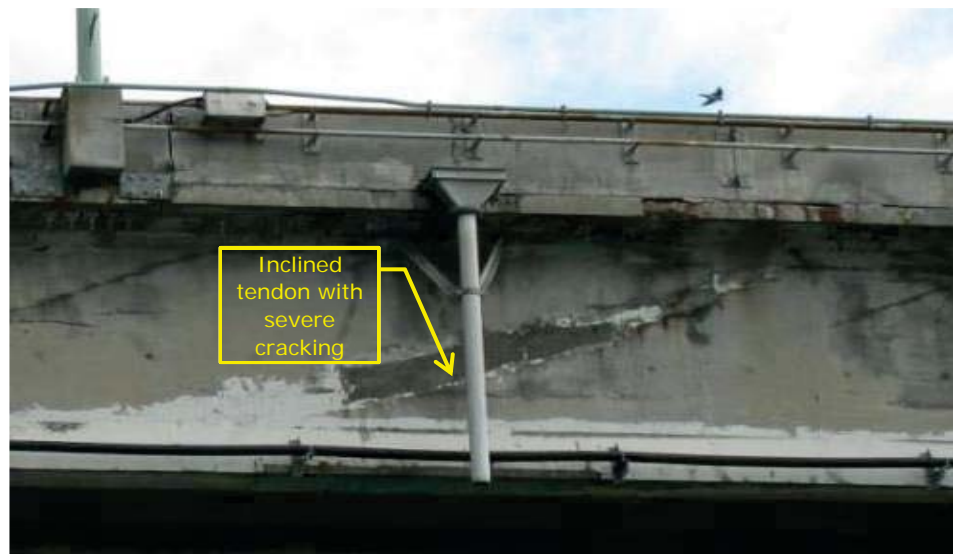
Severe Cracking as Sign of Deterioration of Girder Internal PT
